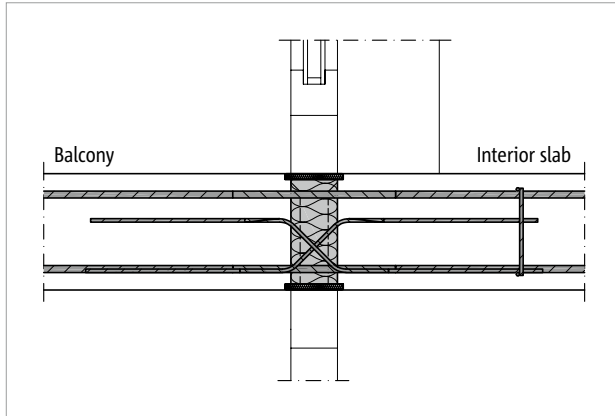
Schöck Isokorb® T Type CD: Installation section; one-way spanning
